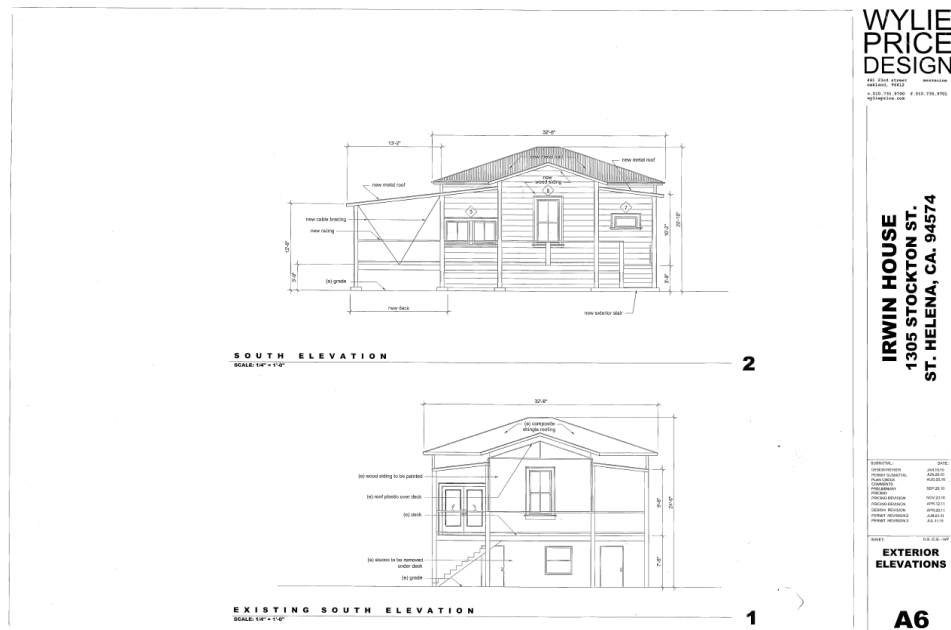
Architectural Drawings of the southwest elevation (Willie Price Design, 2011).
